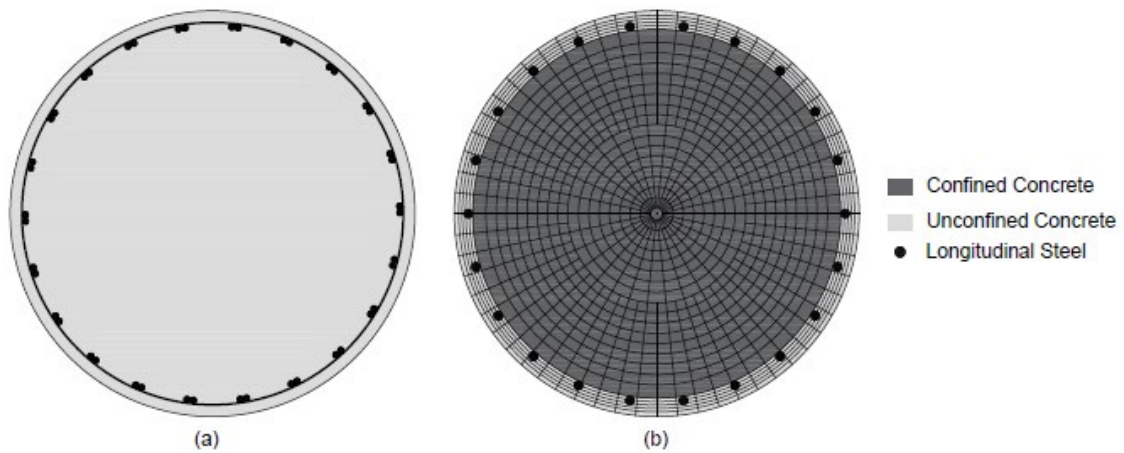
Monolithic column's cross-section: (a) archetype cross-section; (b) fiber discretization
